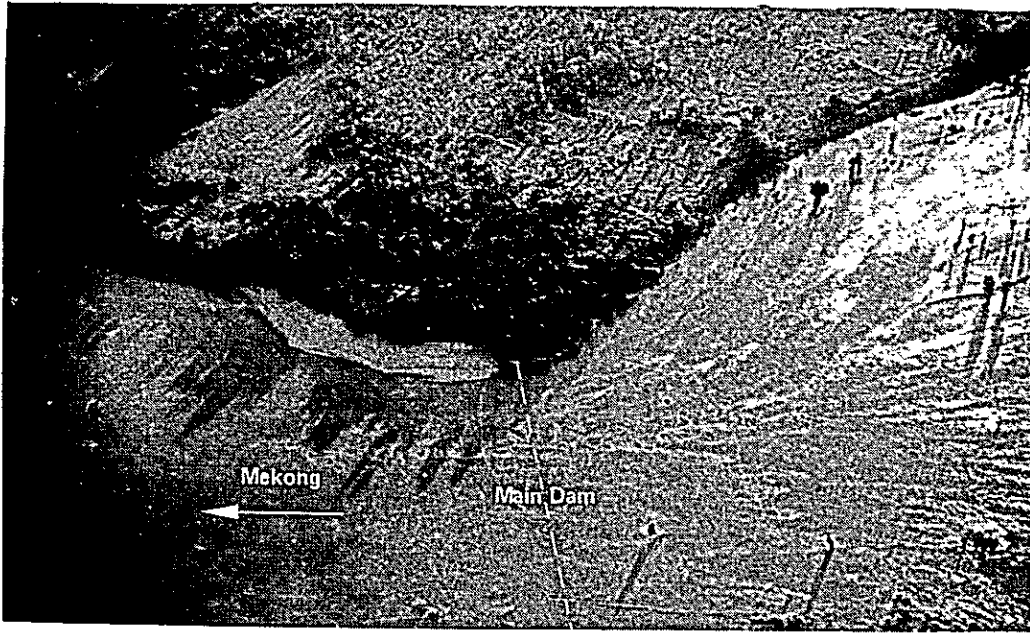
Right Bank of Sambor Dam Site (December 1964)
